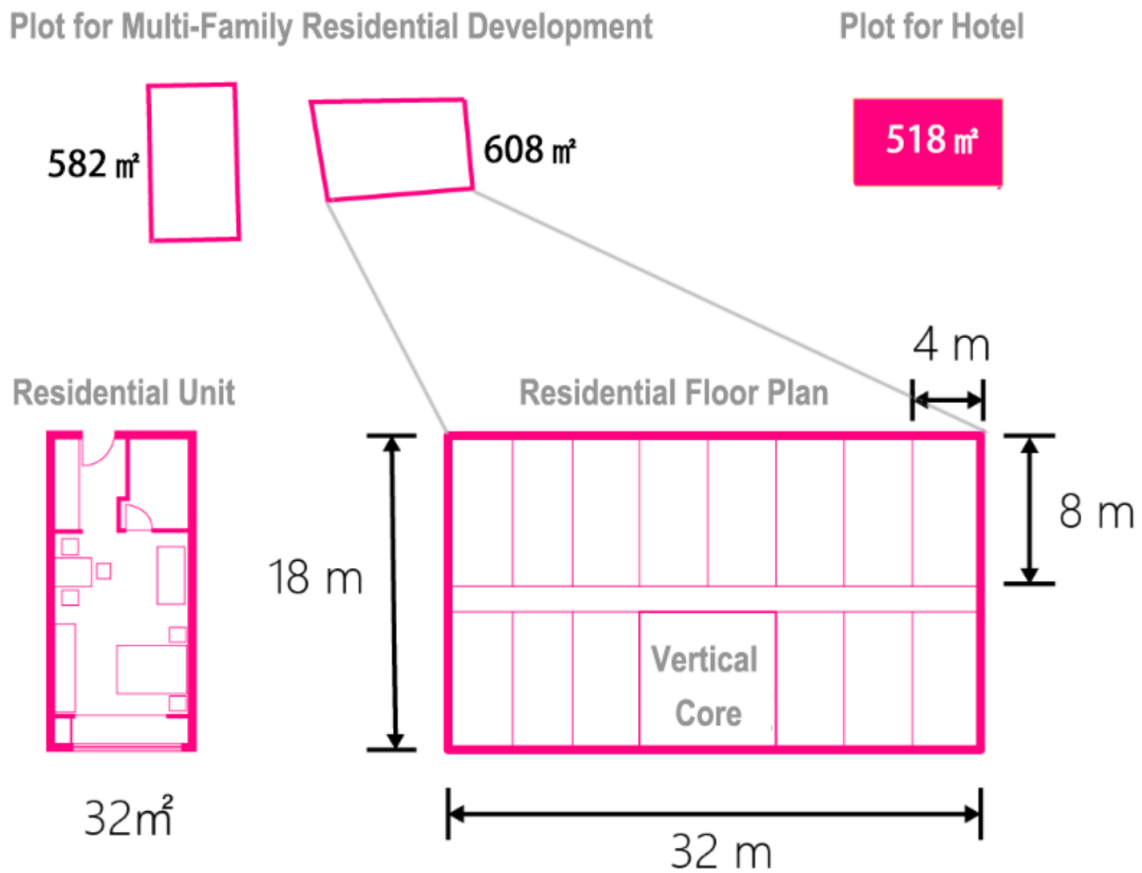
Schematic Floor Plan of Newly Built Multi-Story Residential Building
